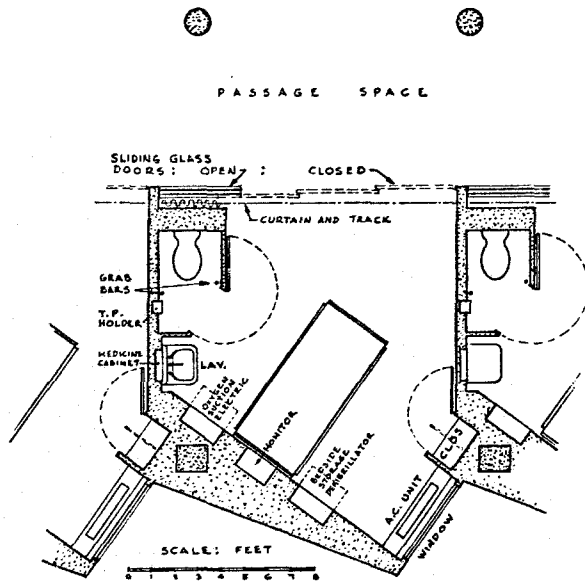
Model Room Floor Plan. Floor plan of "saw-tooth" design of one of 14 rooms in round unit for observation of less complicated acute patients (six-bed intensive unit is separate).
